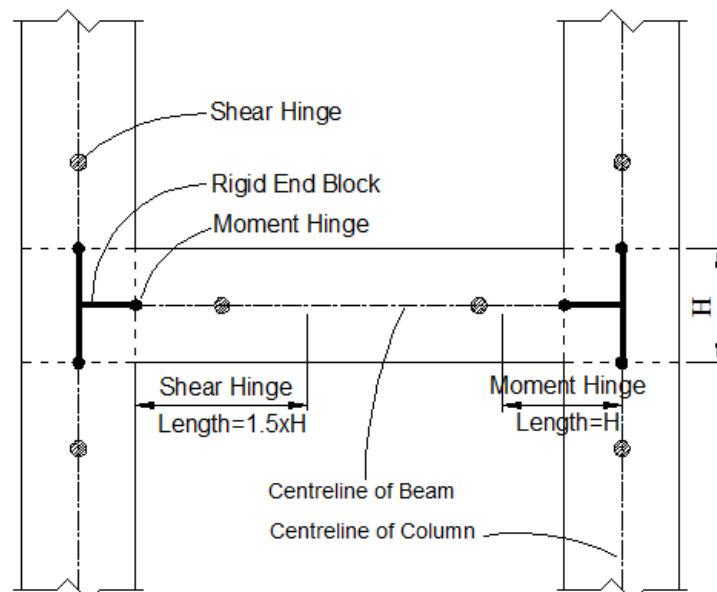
Hinge Locations Assumed in Typical Frame Elements
